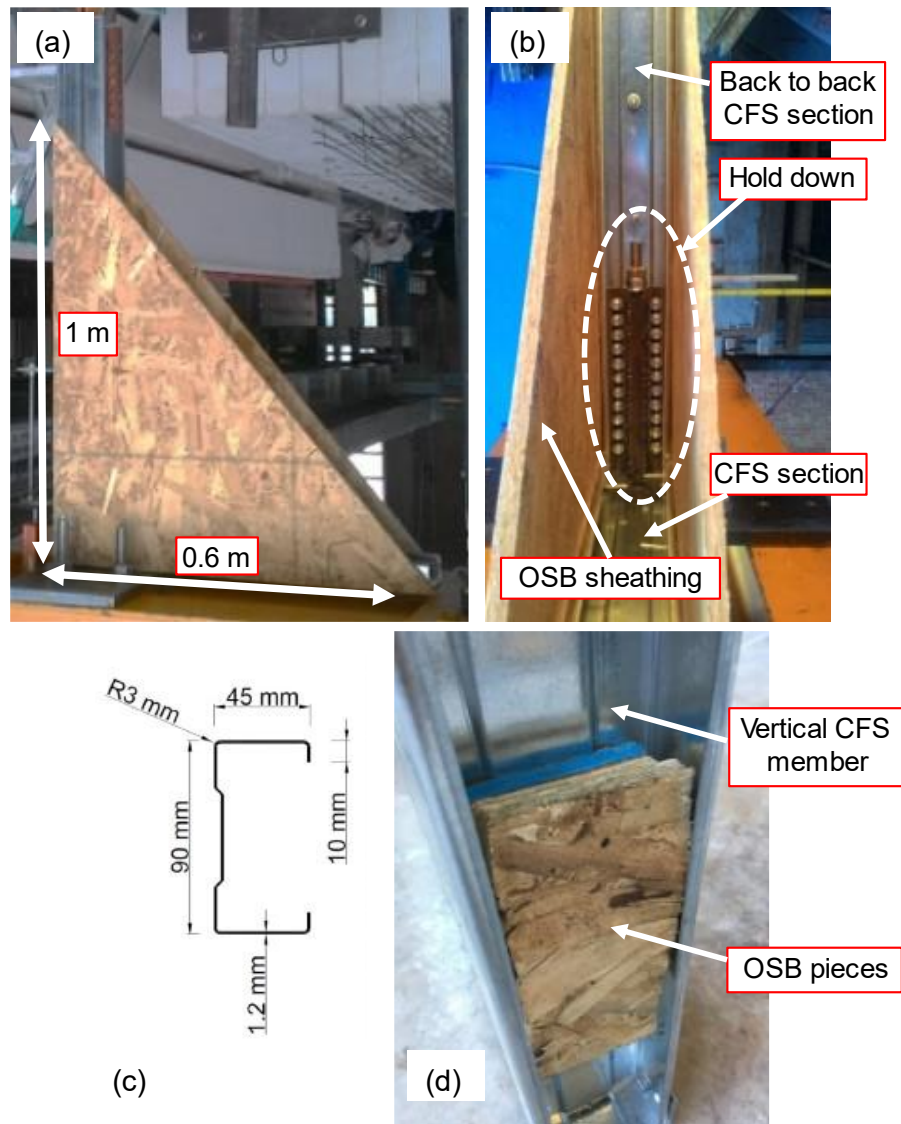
Details of hold-down test specimens: (a) dimensions; (b) details; (c) CFS section used for framing members; (d) OSB pieces at back side of vertical CFS framing member
